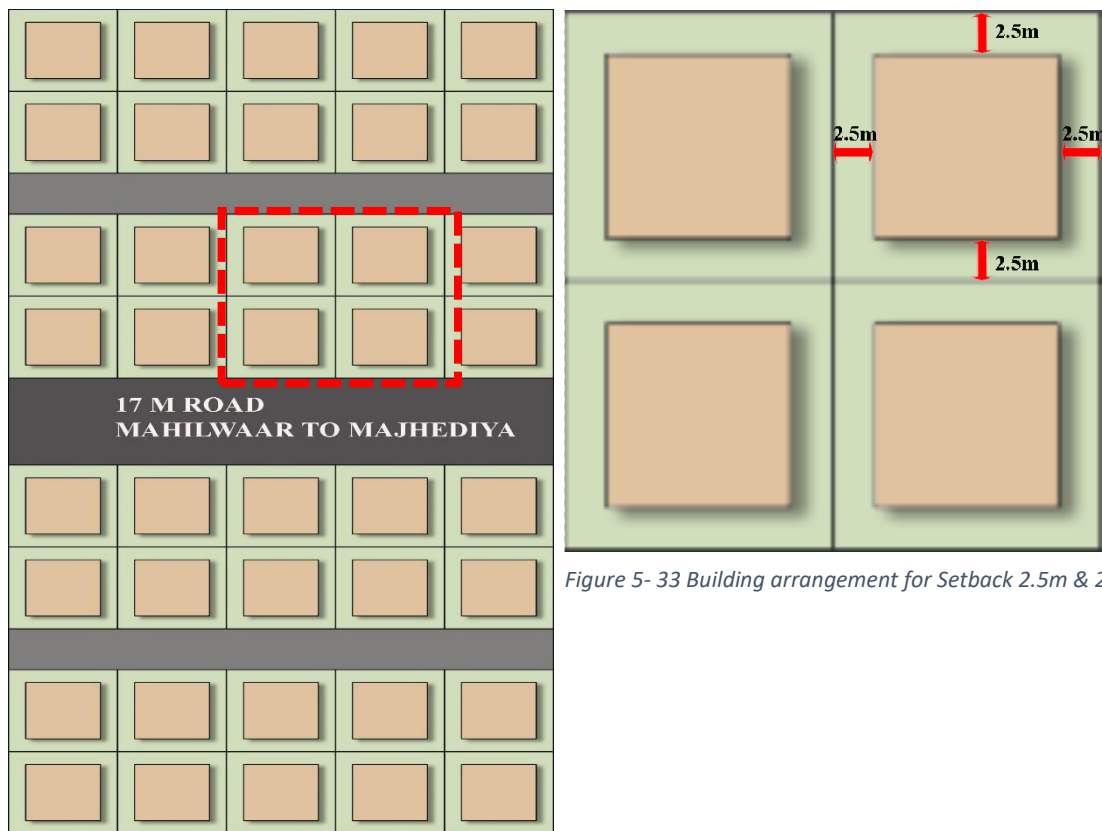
33 Building arrangement for Setback 2.5m & 2.5m
